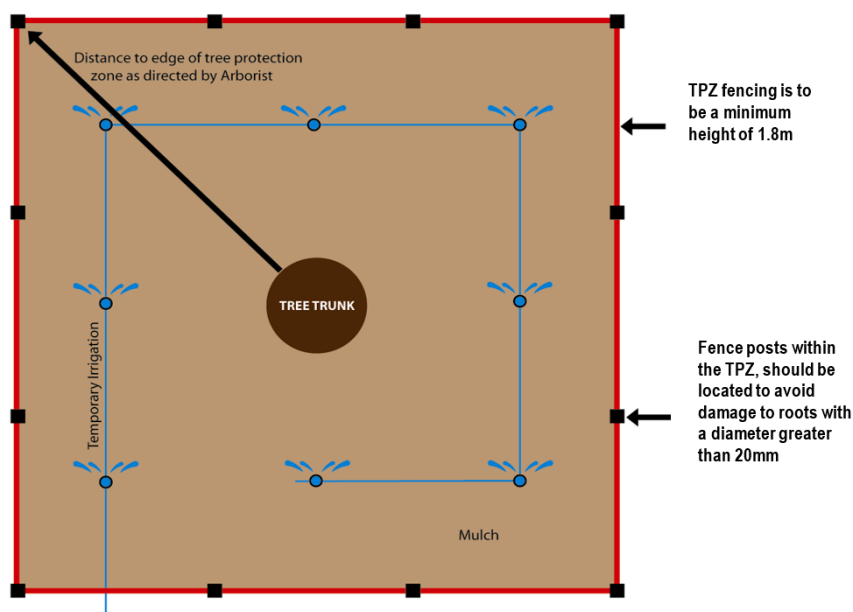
Plan view of a typical tree protection zone with tree protection fencing, mulch and temporary irrigation installed.
